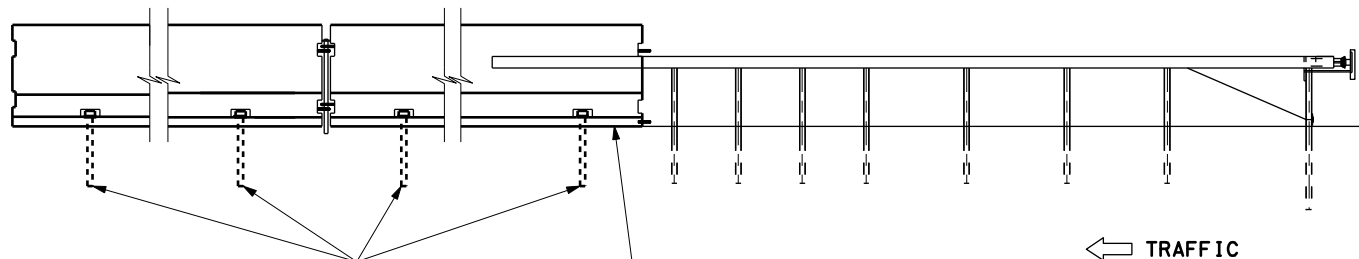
DETAIL WHEN SYSTEM IS INSTALLED WITH CONSTANT SLOPE BARRIER
